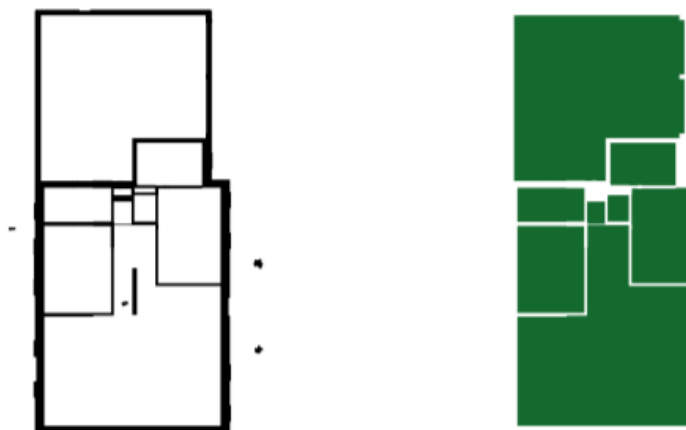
Illustration of room detection for the floor plan (Ahmed, Liwicki, Weber & Dengel, 2011)
